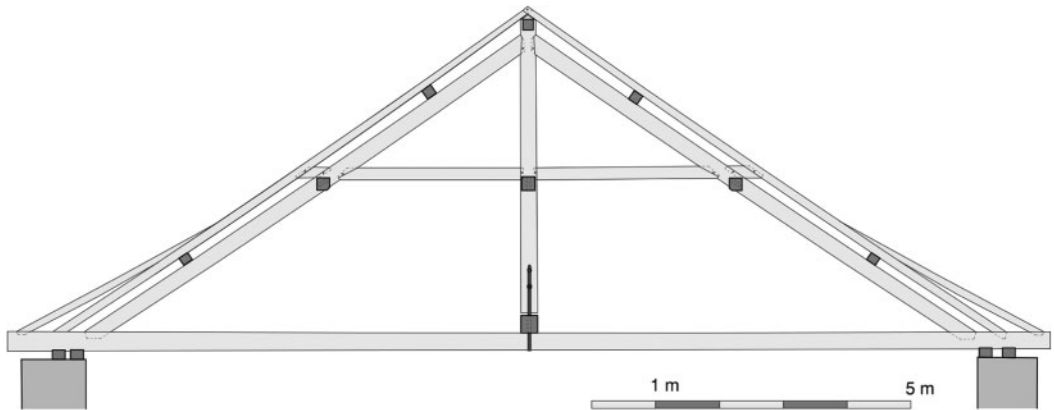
Total station survey of a principal truss of the reformed church at Embrach (Schäfer 2020).
